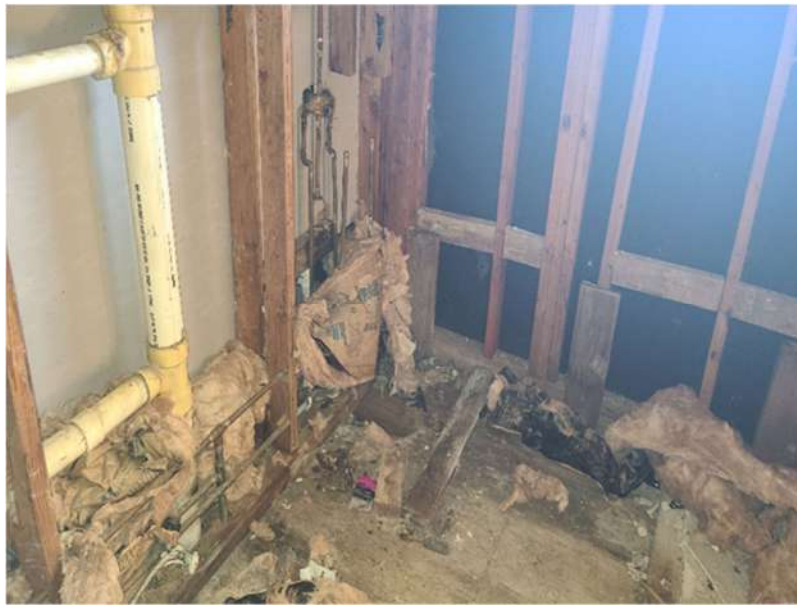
Lower framing and plywood in second floor bathroom is rotten.
